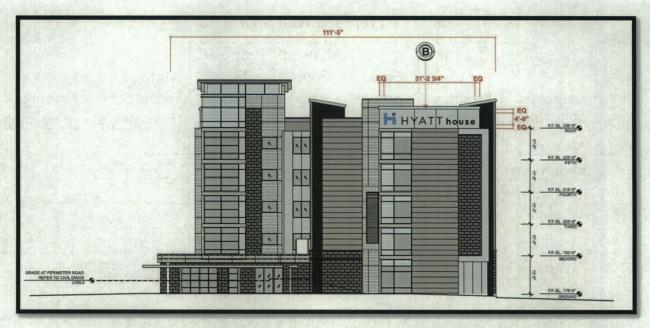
Freeway Oriented Wall Sign (Facing I-280)
